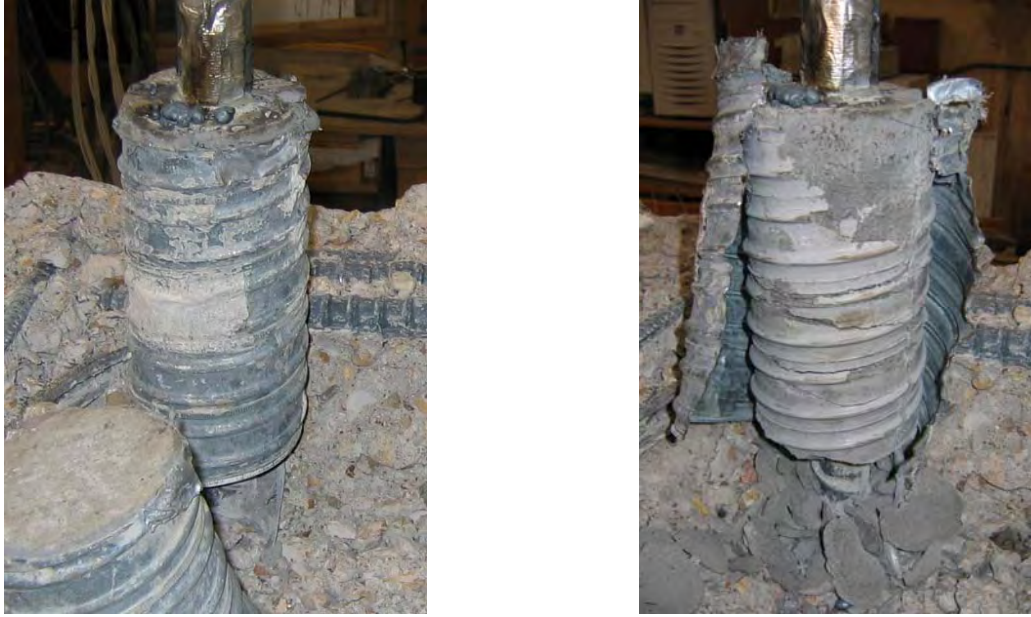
Observed Failure of Left Connector, Test 23 (Double Connector, Galvanized Steel Duct)
